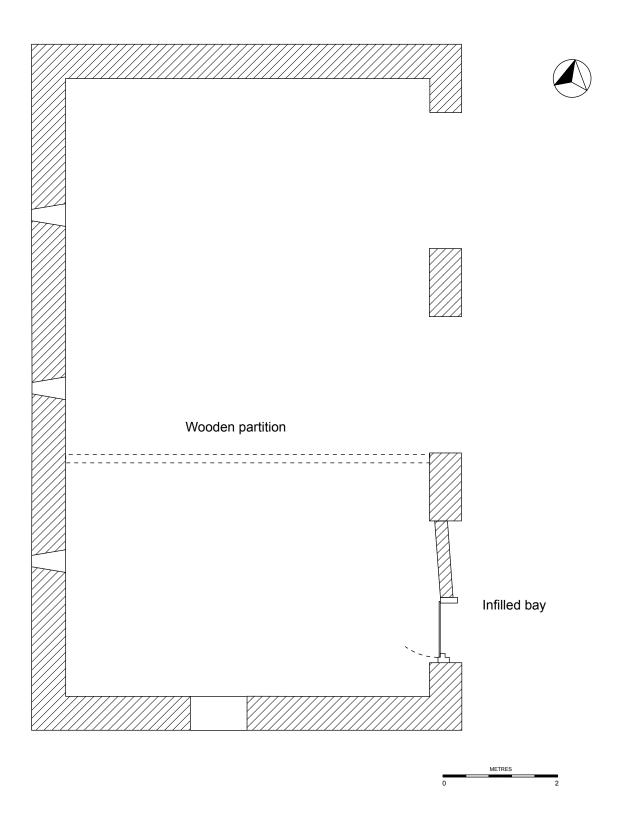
Site 10, Field barn Tal-y-Waenydd, plan
